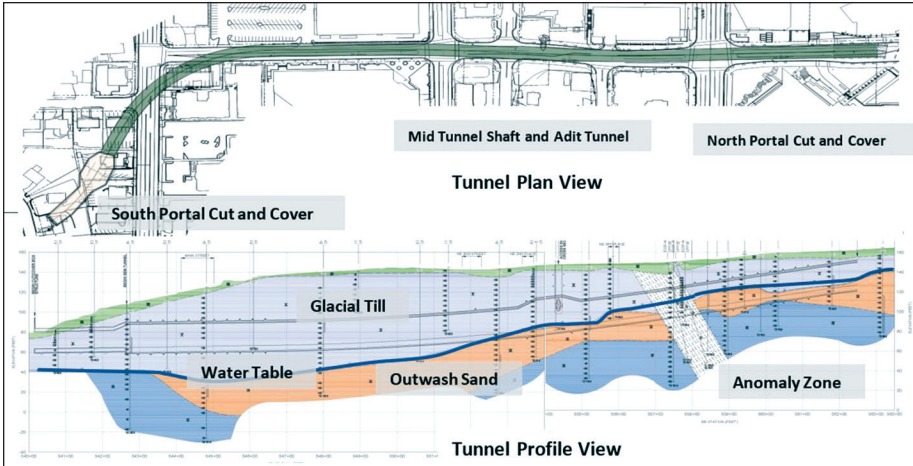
Plan and Profile View of Downtown Bellevue Tunnel
